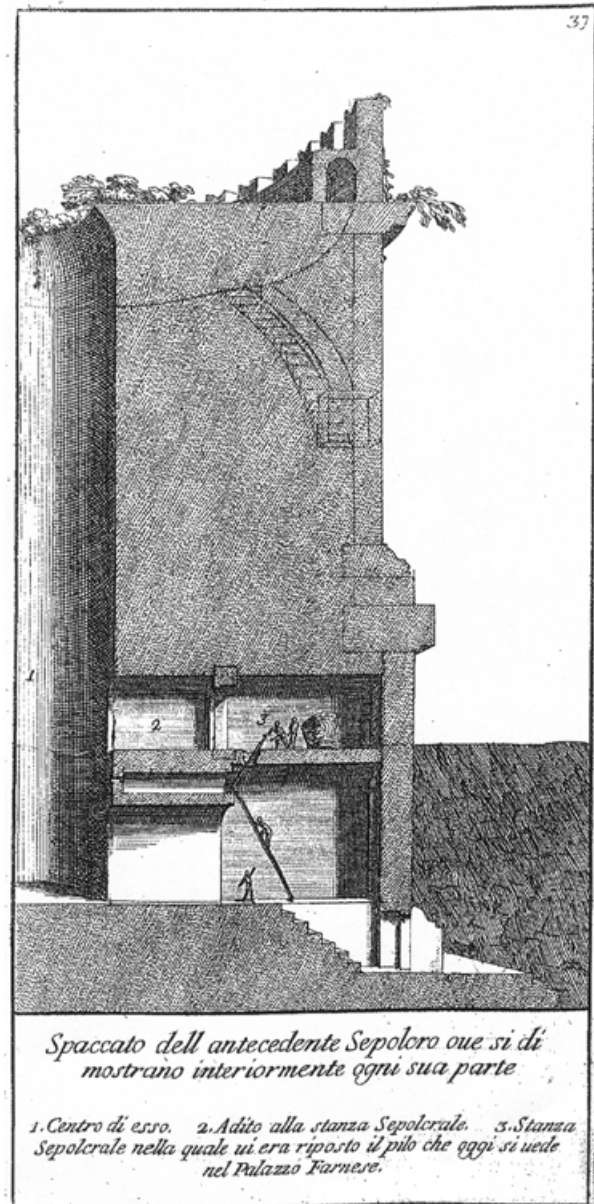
Reconstructed elevation and cross-section of the tomb of Caecilia Metella. Bartoli 1697, tav. 36–37.
